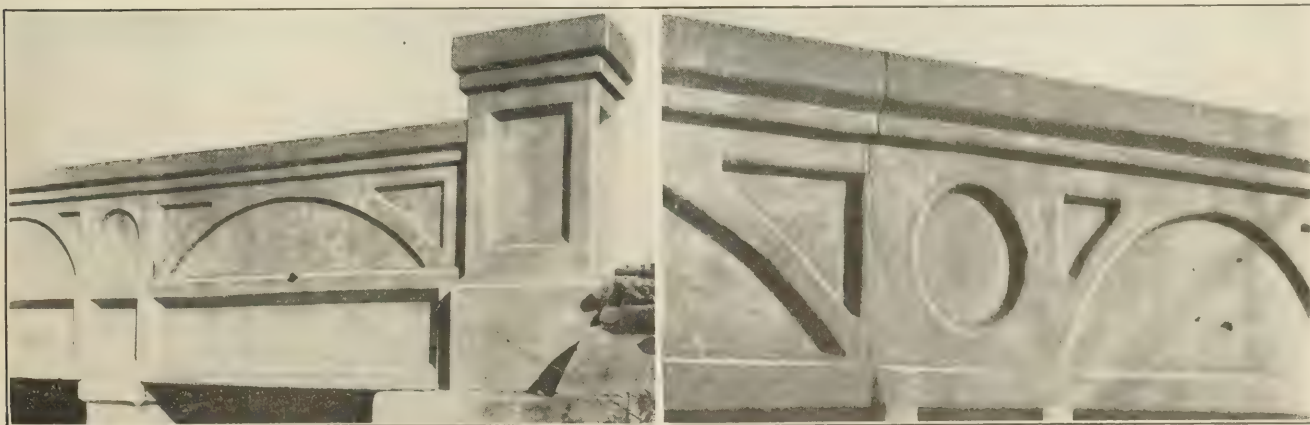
TO 10. SHAW AVE. BRIDGE CARRYING TWO-TRACK RAILWAY
